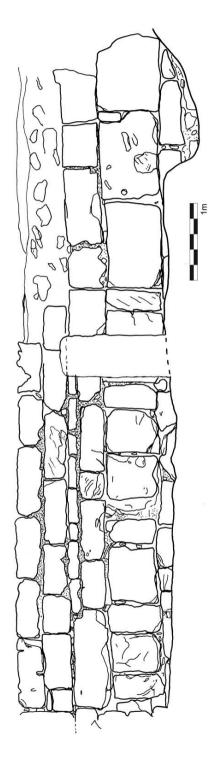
Elevation of Section of West Fortress Wall south of Tower 14 Drawing J. frey
